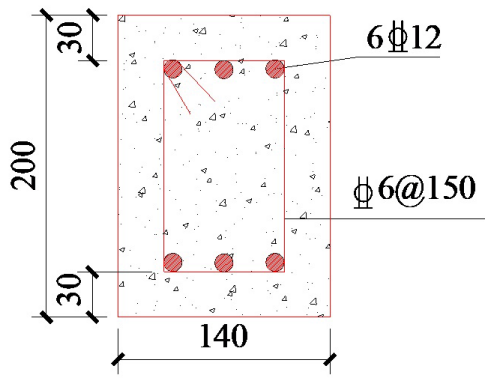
Normal cross-section of lower chord and its reinforcement in a roof truss
